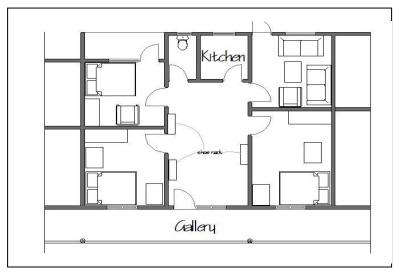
Typical flat in the I-shaped block in Kilwa road housing estate after modification in which a store was changed into a kitchen. The sitting room plays a role as common space from which all other spaces in the apartment are accessed. Note that in this apartment three bachelors have a bedroom each and share a kitchen, toilet and the sitting room as their lobby.
